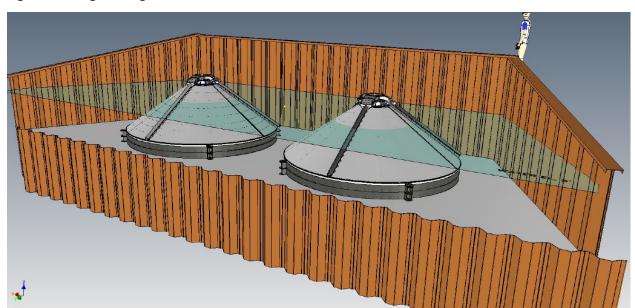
Engineering Detail of the Two Brush-Cleaned Cone Screens
